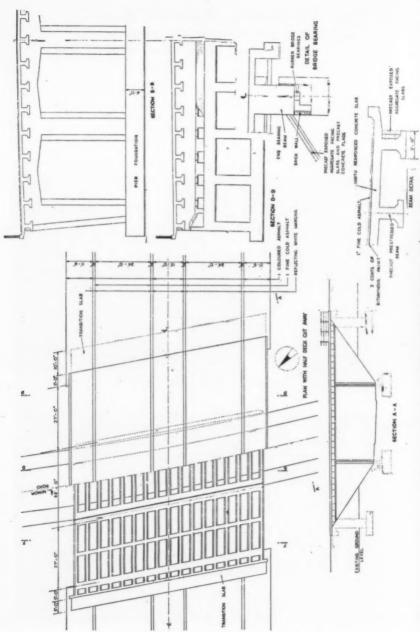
Typical Details of Bridges shown in Figs. 1 and 2.
